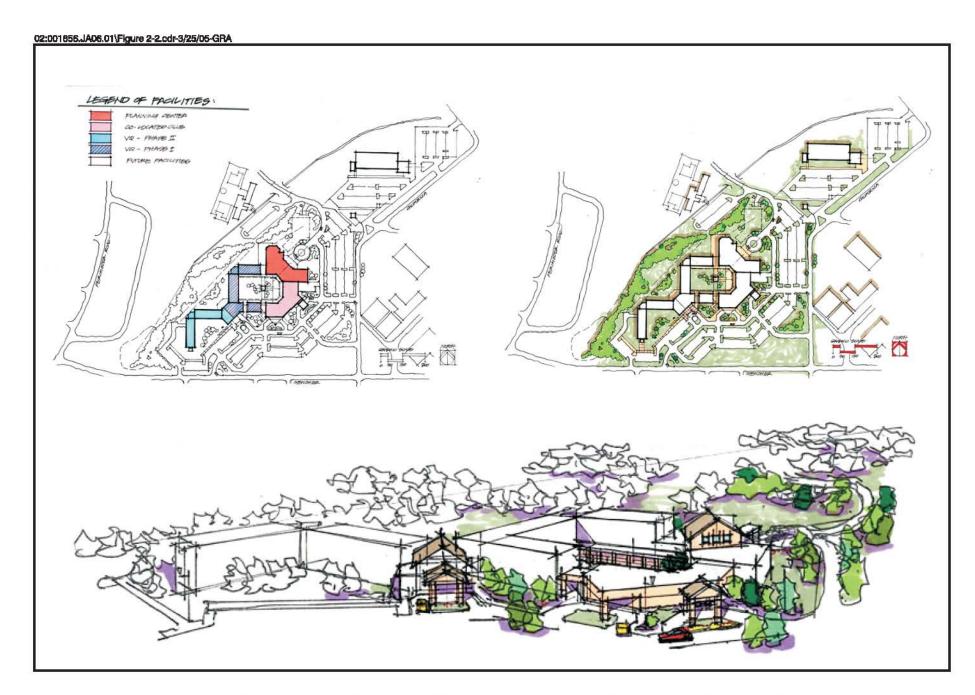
Layout of the Proposed NCR Readiness Complex, Andrews AFB (Alternative 1)
